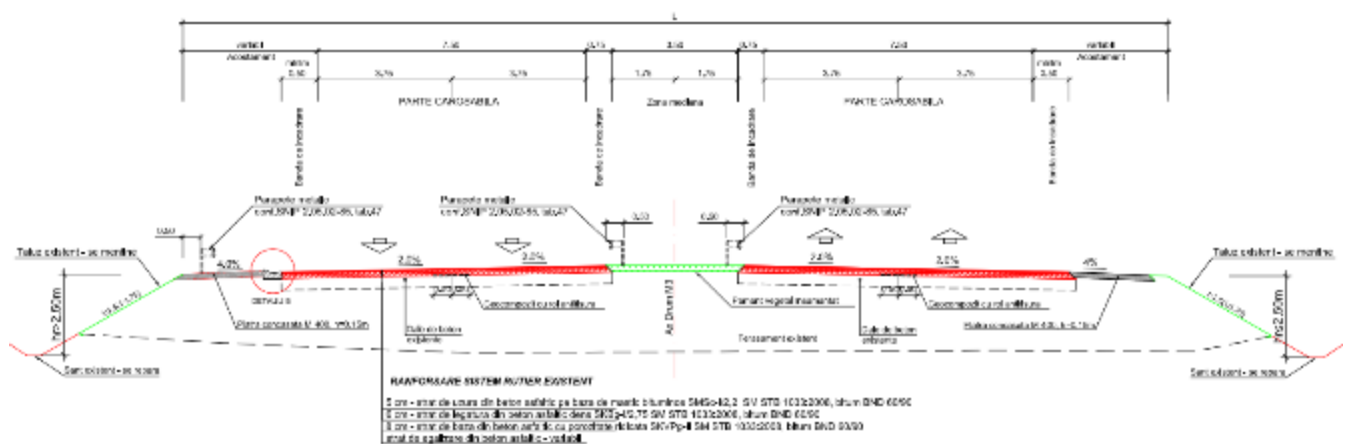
Typical Roadway Cross-Section and Structural Reinforcement Design
